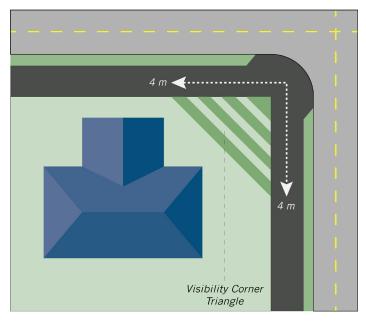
The intersecting Lot lines at a street corner and a line joining points along said Lot lines 4.0 metres from their point of intersection.
